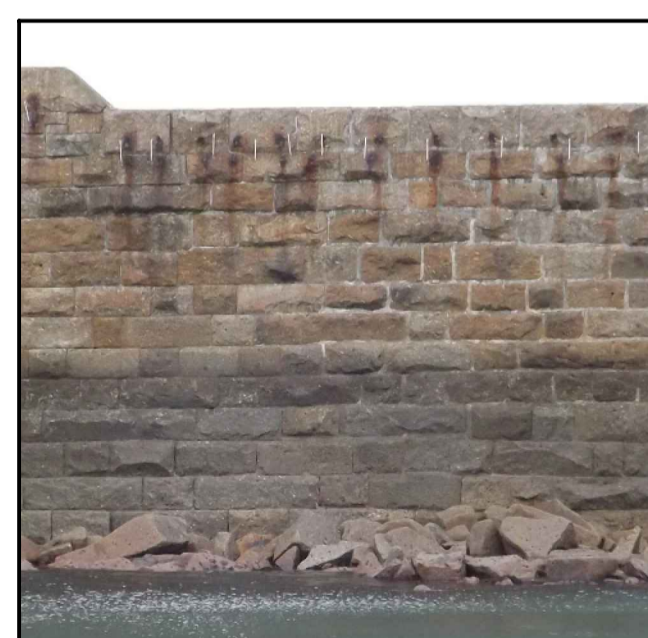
Eastern Section of the Lighthouse Pier (Southern Face)
